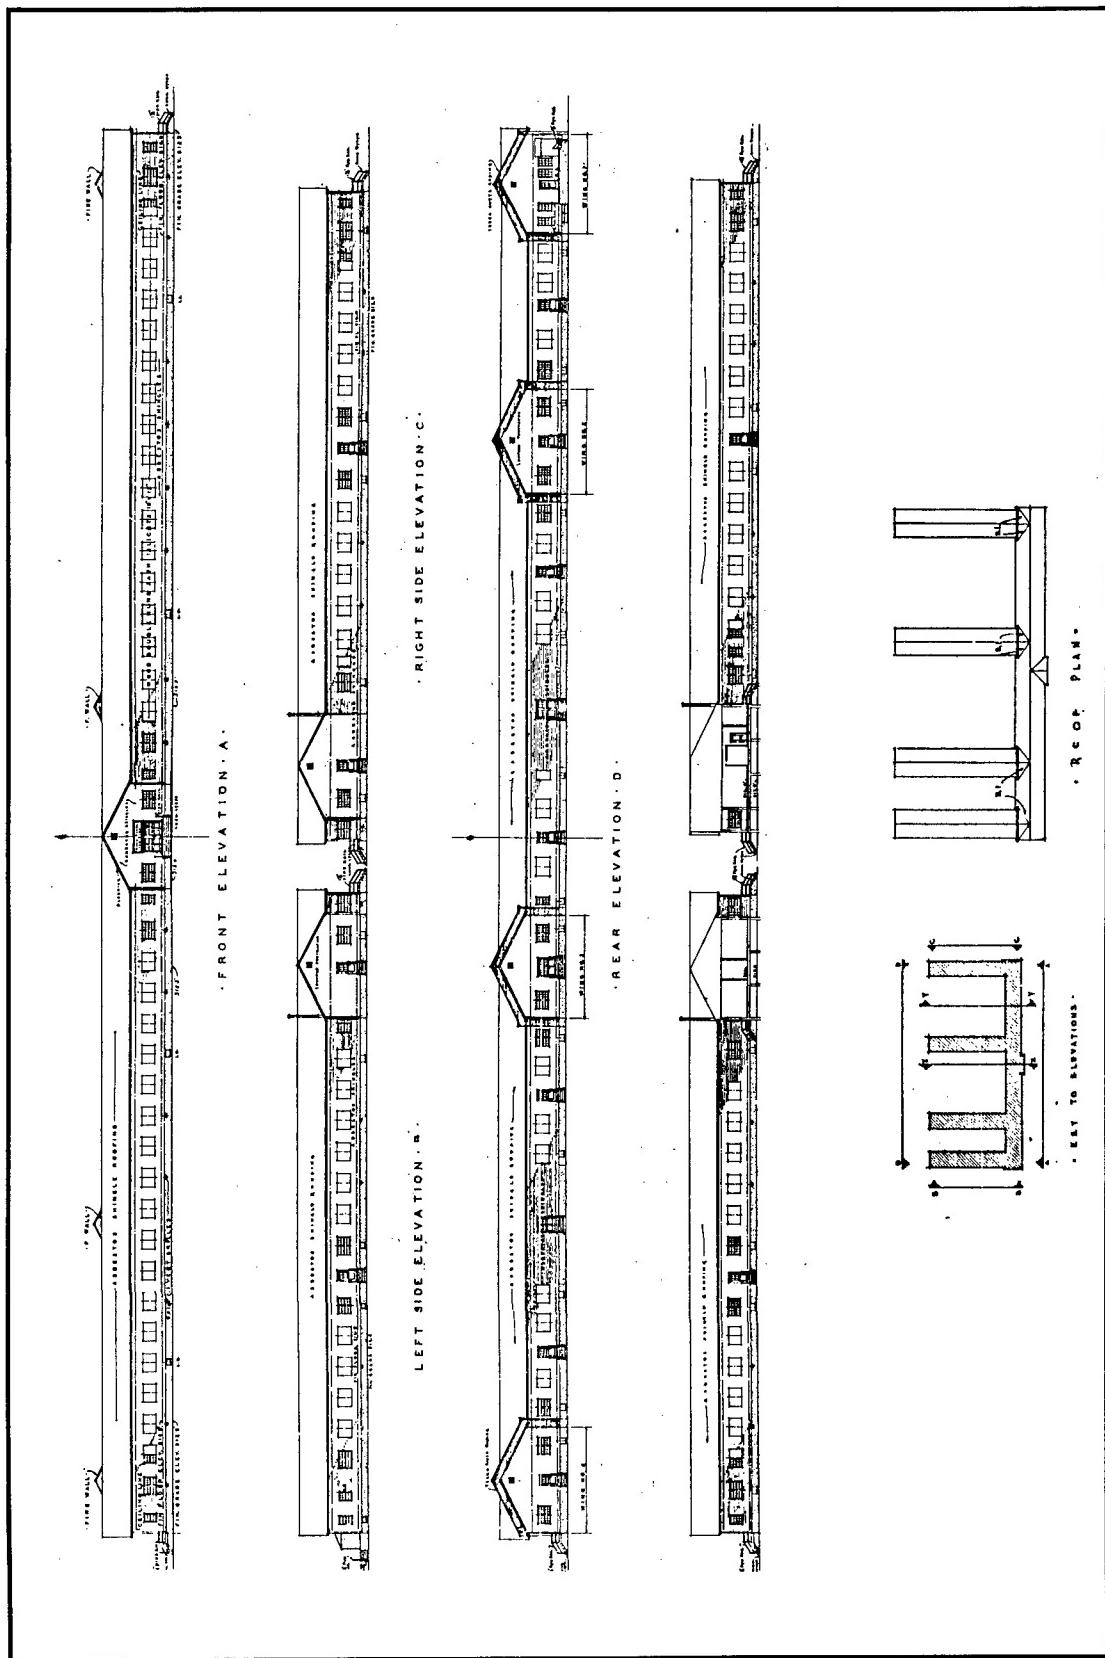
Elevations, Administration Building (Building 2501), Hoosier Ordnance Plant (INAAP Drawing 7020-123).
